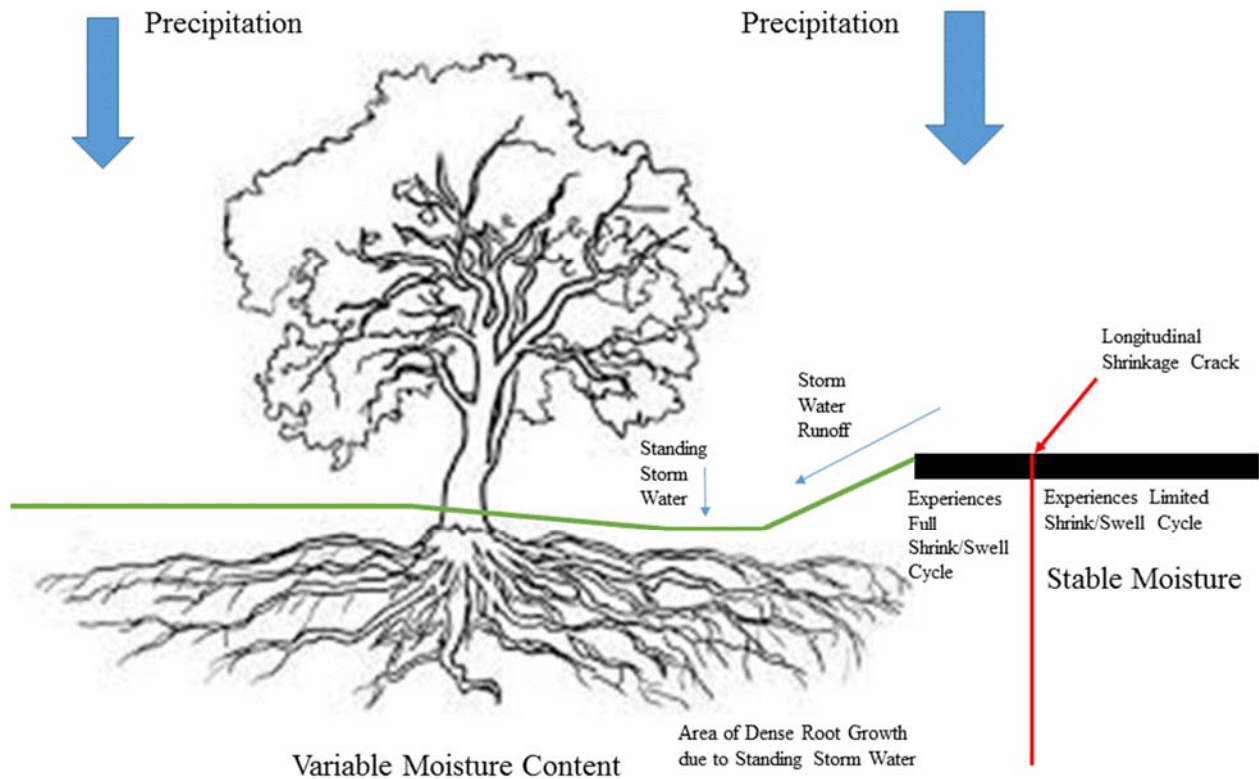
Driving Factors behind Pavement/Slope Damage near Boring B5.0 MP 52.85
